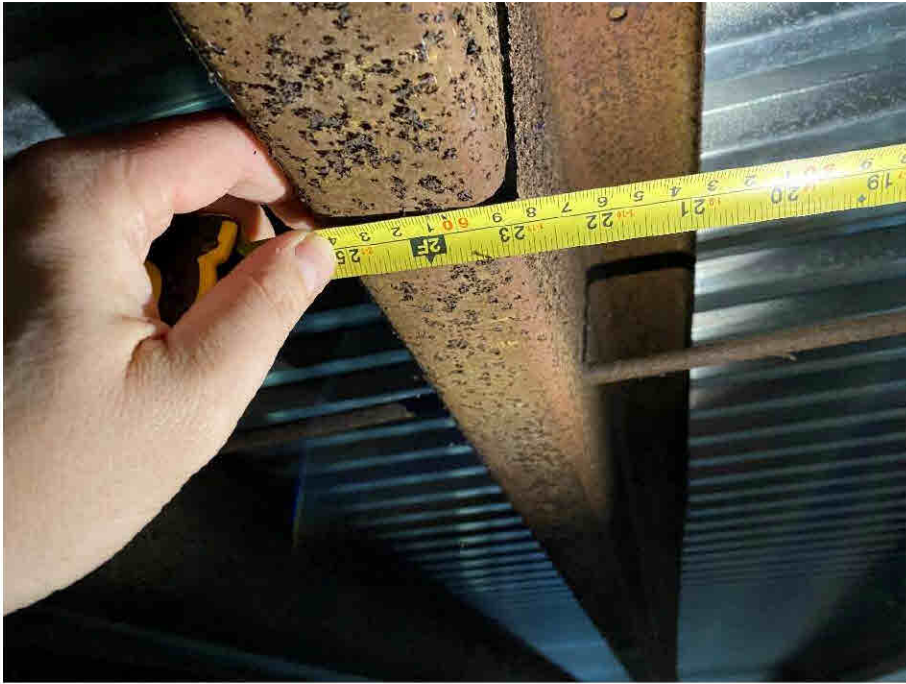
Depth of Tapered Rafter at Eaves Approximately 380mm.
